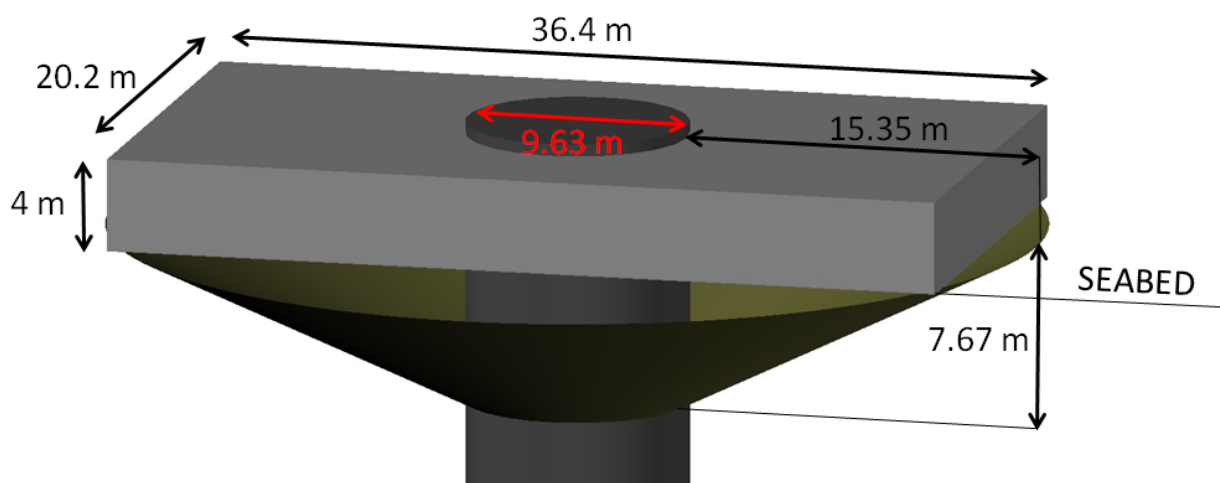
3D Rendering SW Tower Equivalent Pier
